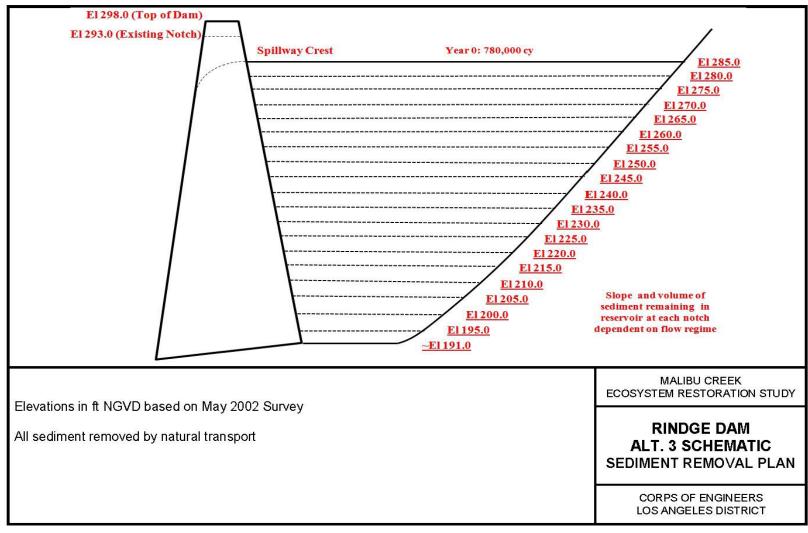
Rindge Dam - Alt. 3 Schematic, Sediment Removal Plan
